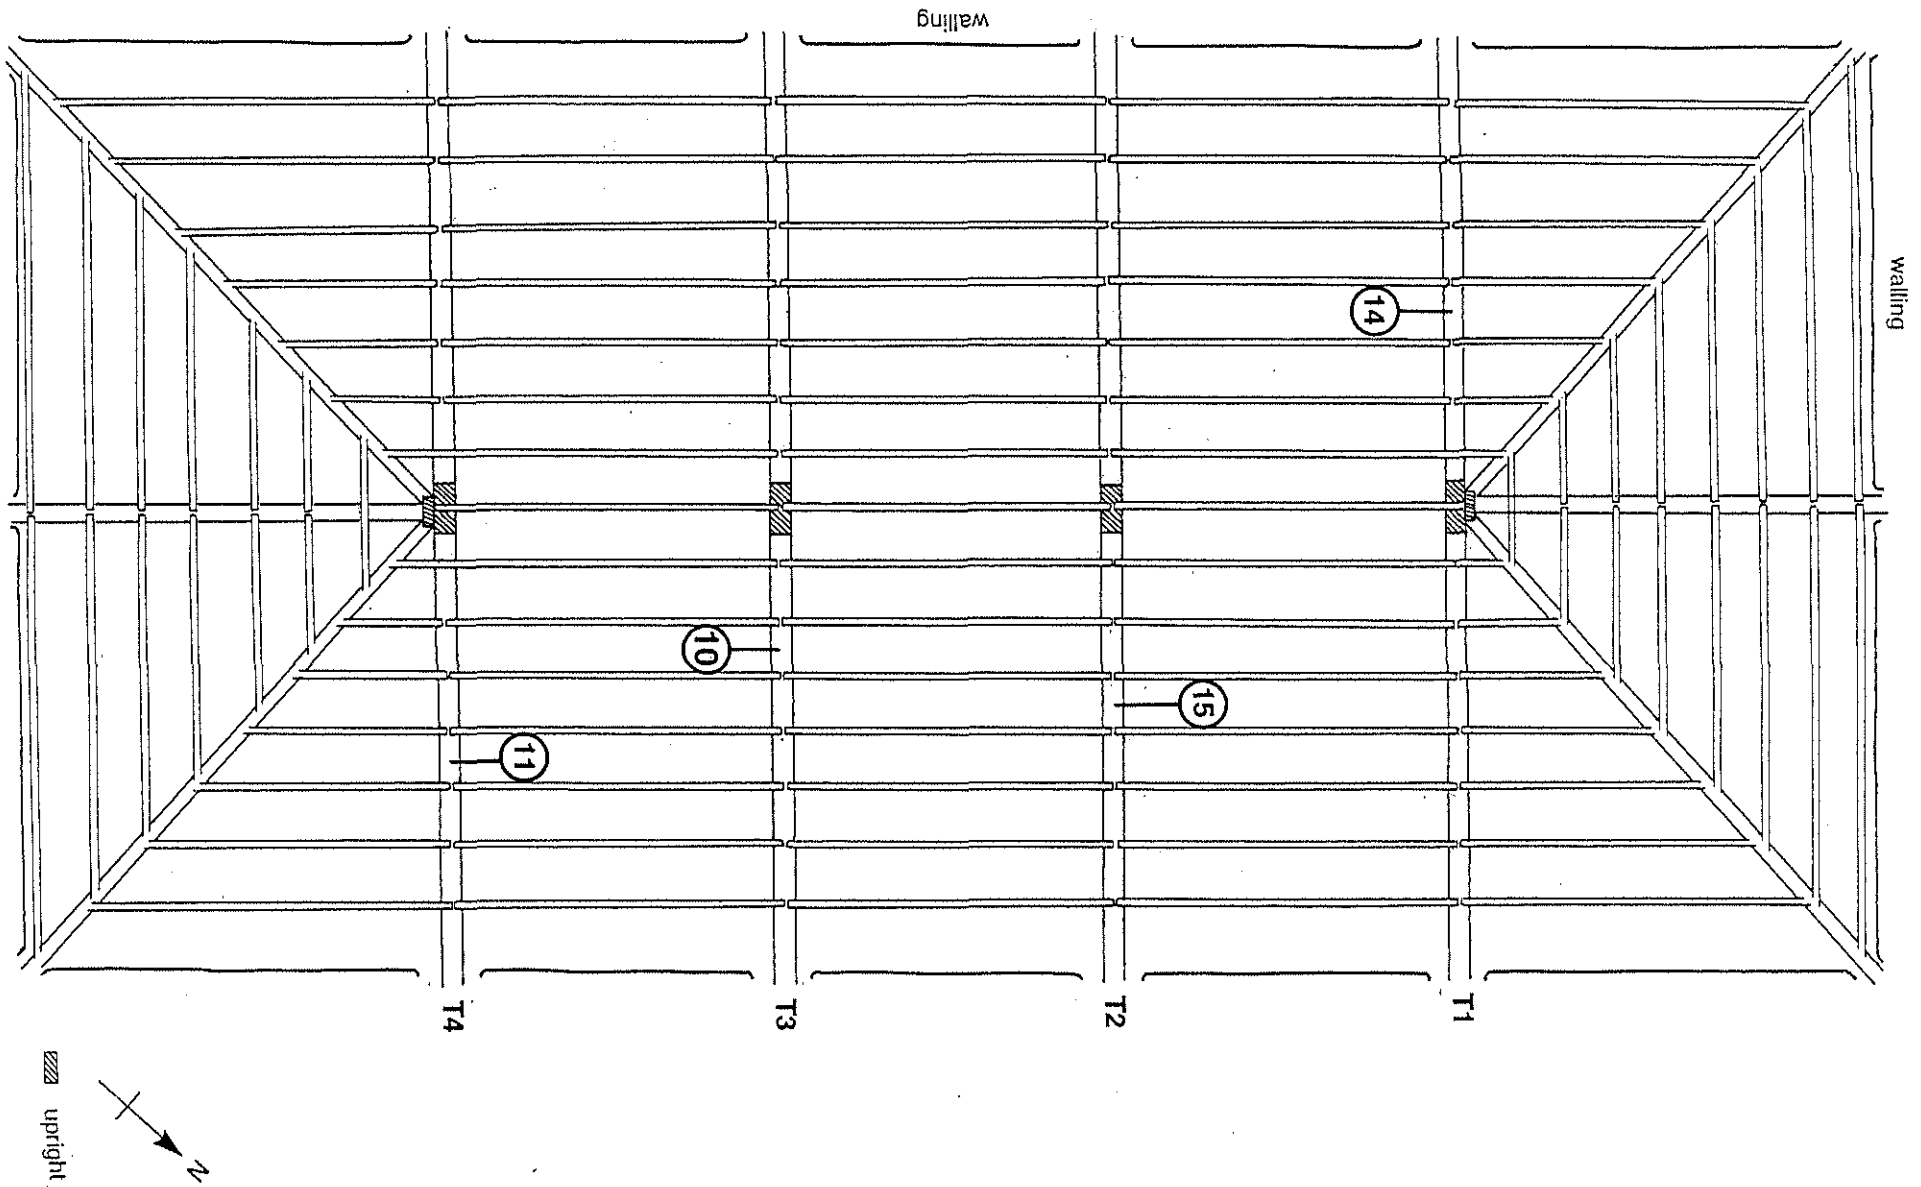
Bolsover Castle, east roof of Little Castle; plan of tiebeams and joists to show position of timbers sampled
